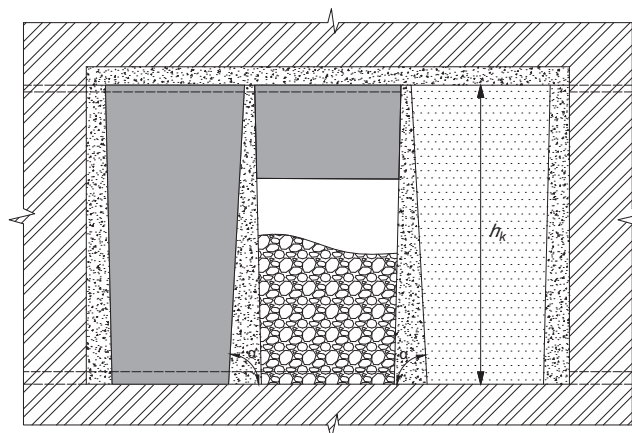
General view of the frame mine structure with the trapezoid-shaped backfill frames:
